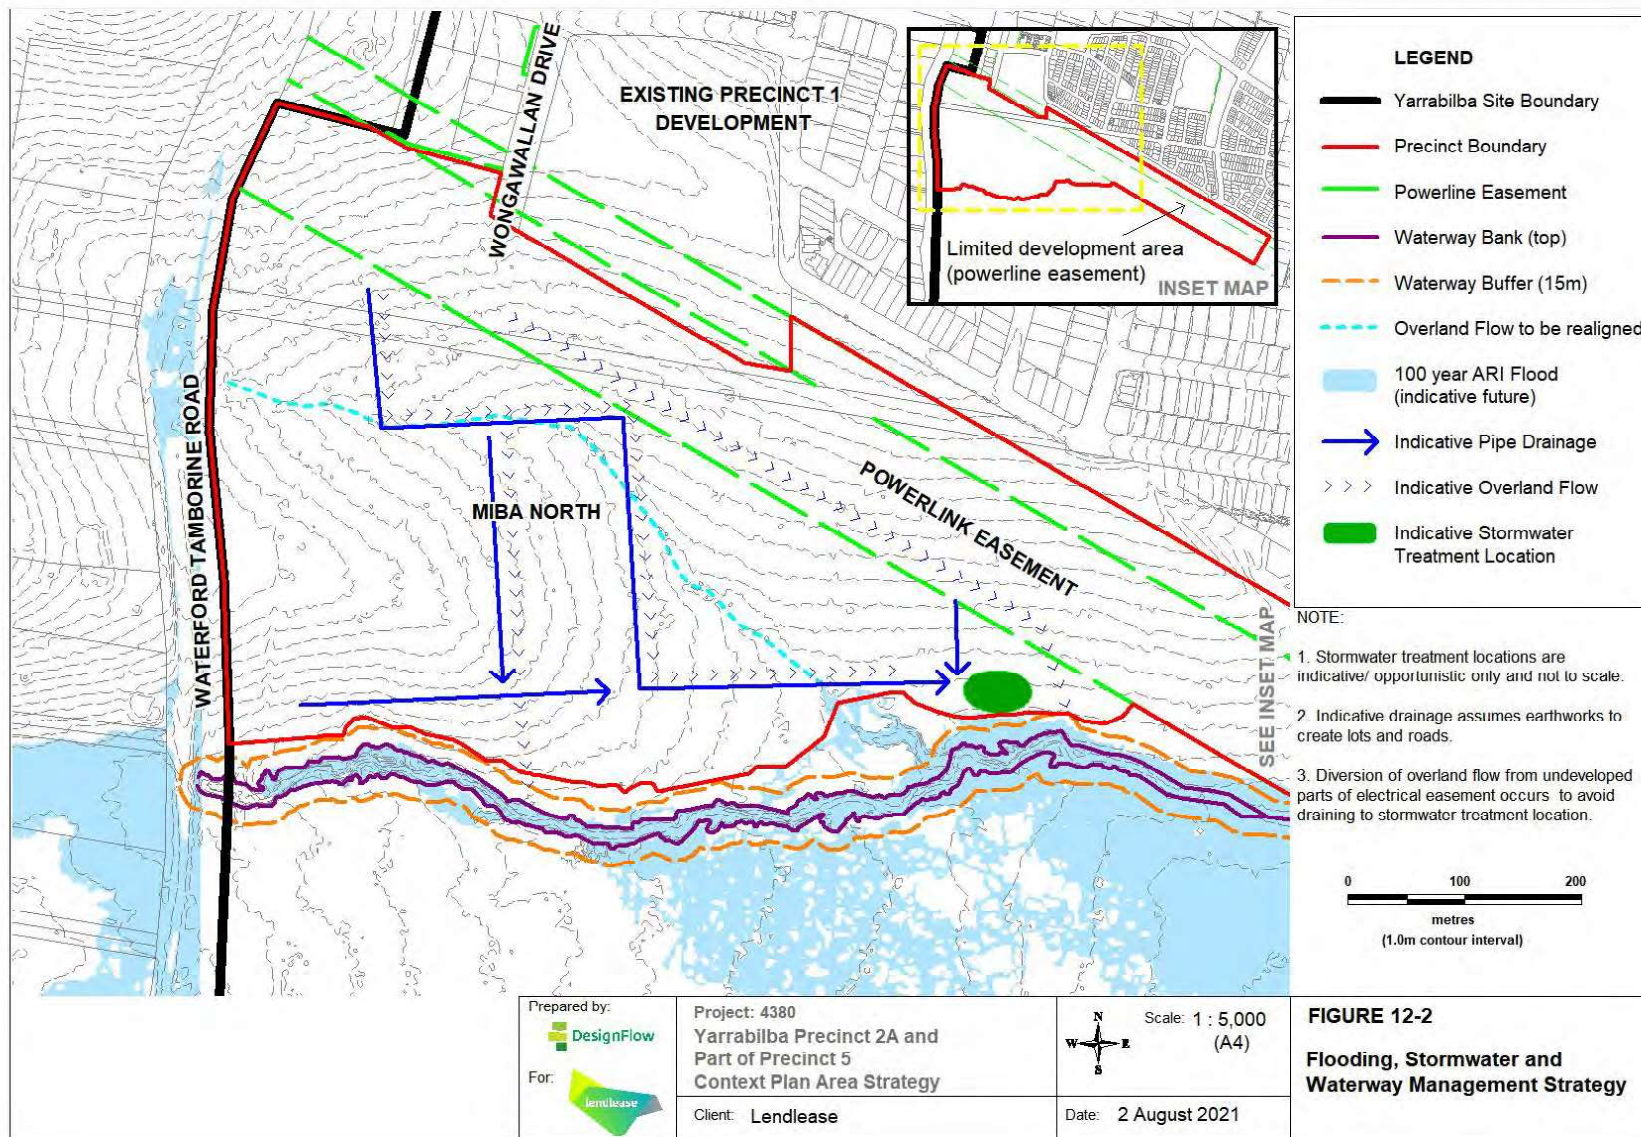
Flooding, Stormwater and Waterway Management Strategy
